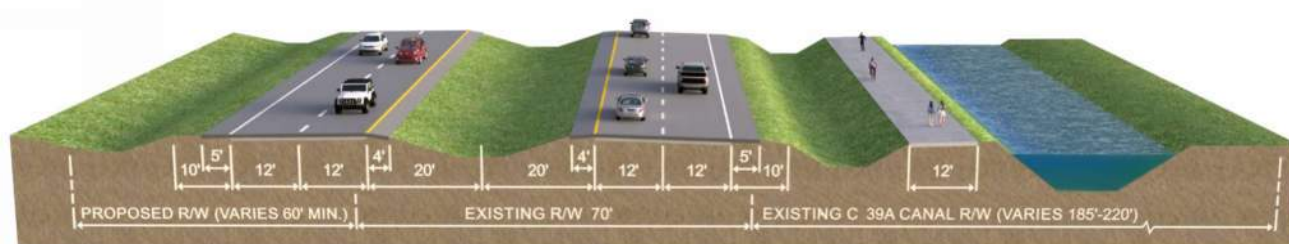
SR 70 – Proposed Roadway Typical Section Two
